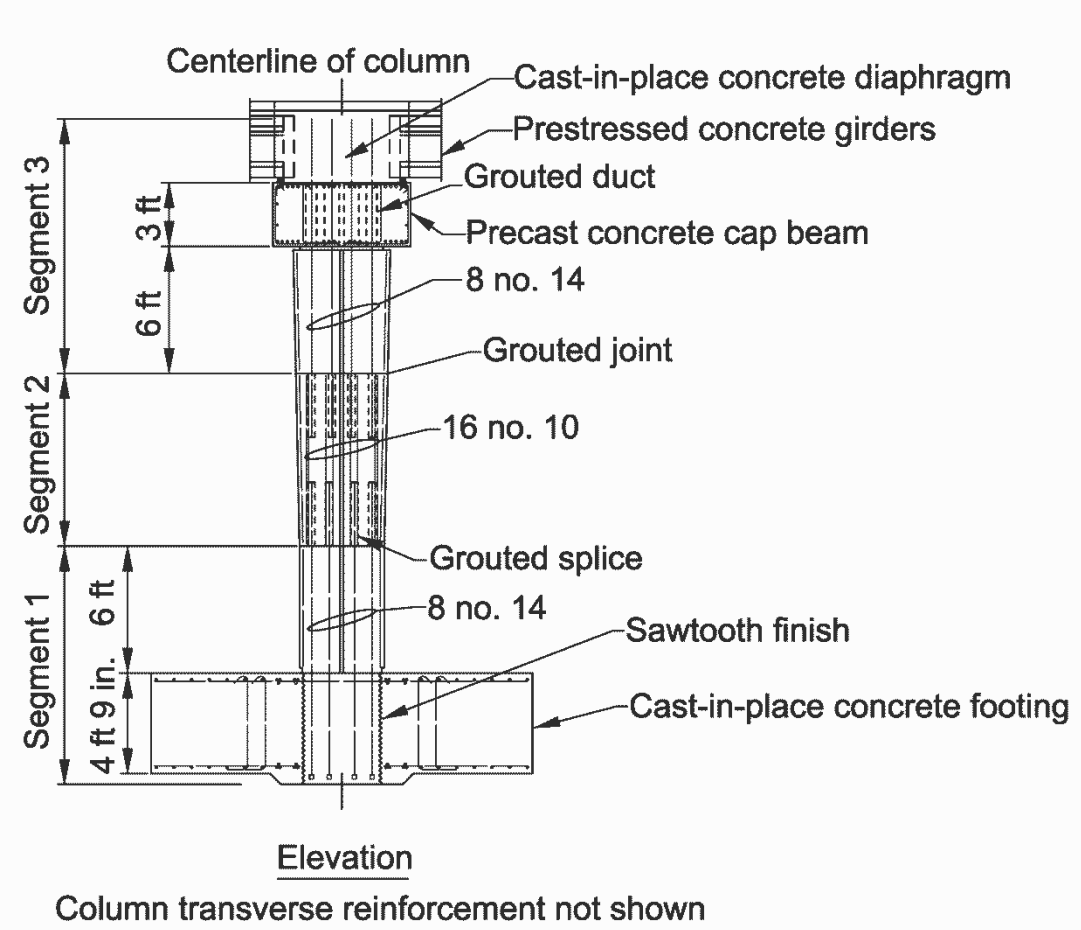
Diagram. Typical precast pier and cast-in-place footing.
